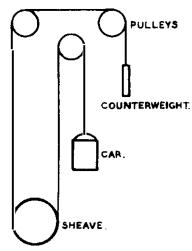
Half-Wrap, One-to-One Drive With Machine Below Well.
